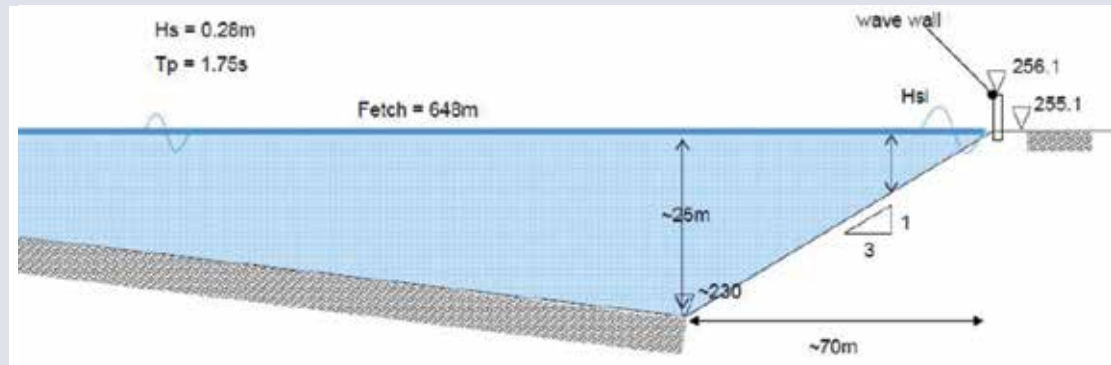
Schematic of dam and wave wall – input conditions for the calculations
